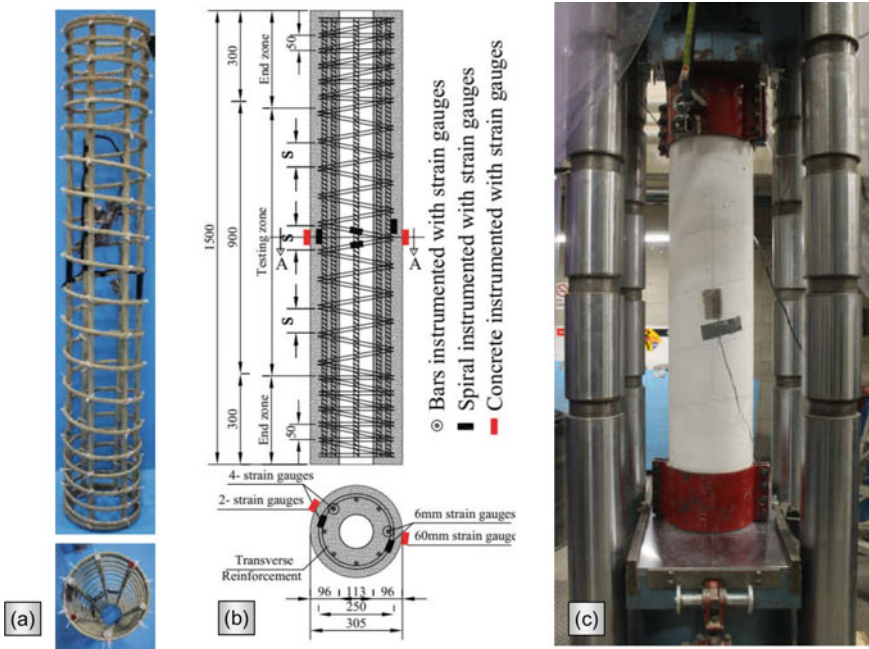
Experimental program layout: a GFRP reinforcement cage; b specimen’s details and instrumentations; and c FORNEY machine “final installation of the specimen”
